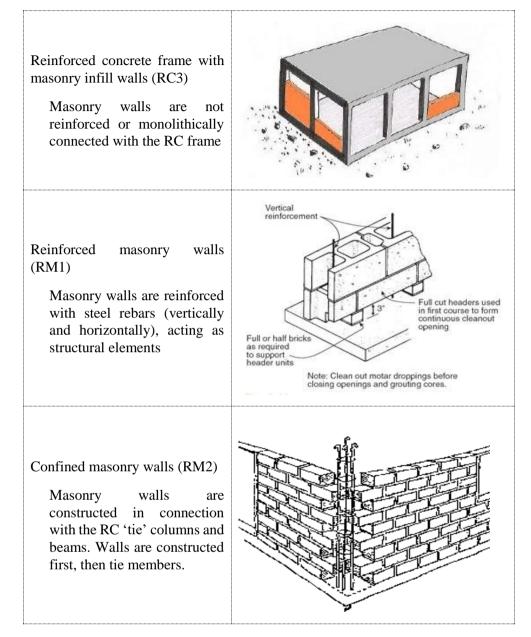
Schematic representation of different types of concrete frame with infill, reinforced masonry and confined masonry construction.
